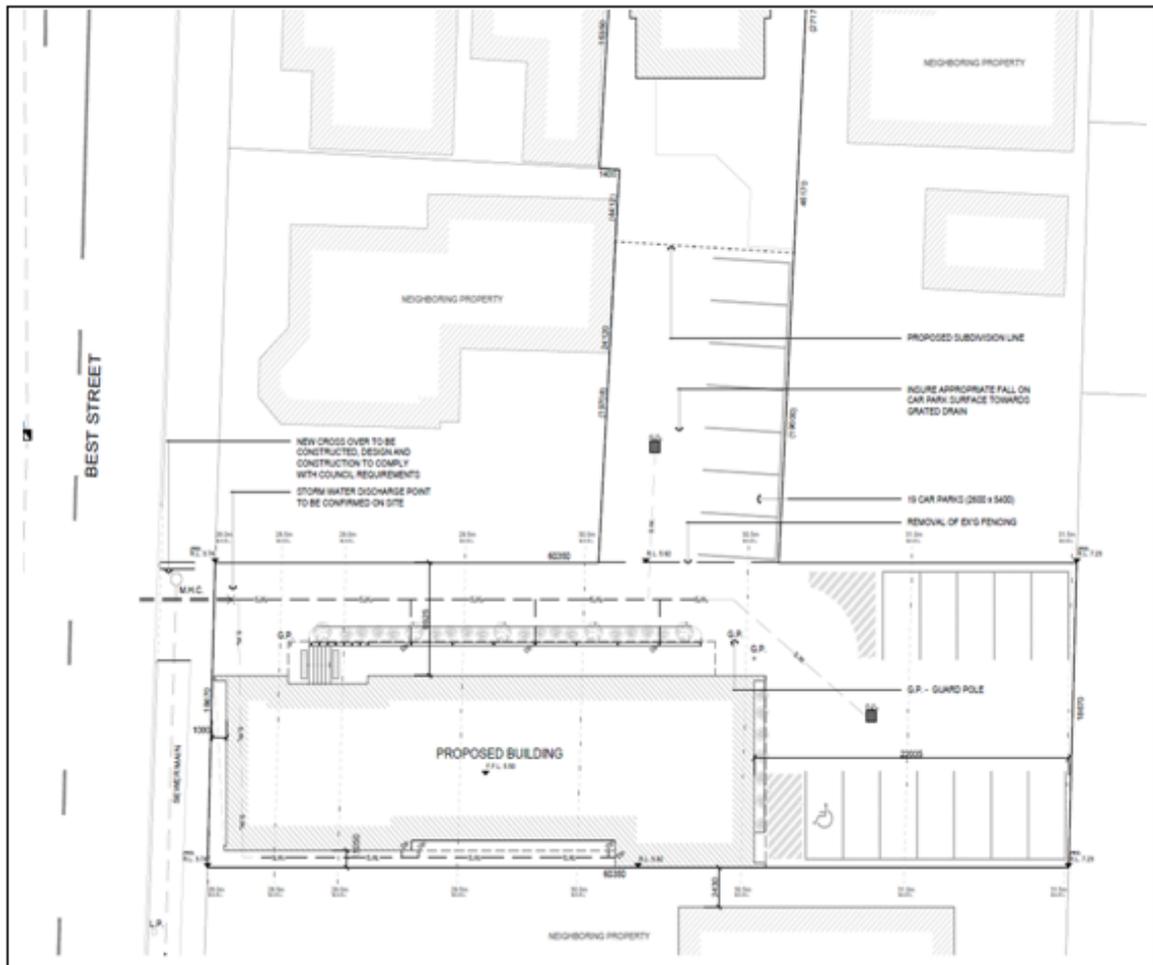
Site development plan, Lachlan Walsh Design, Project 16-296
